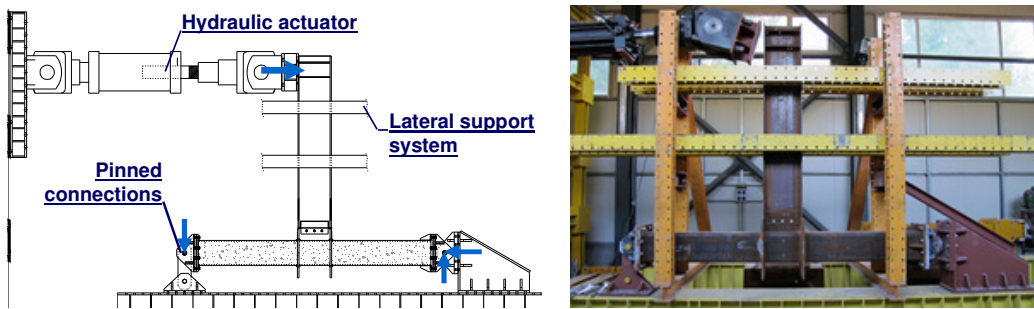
Conceptual scheme and illustration of the test assembly
